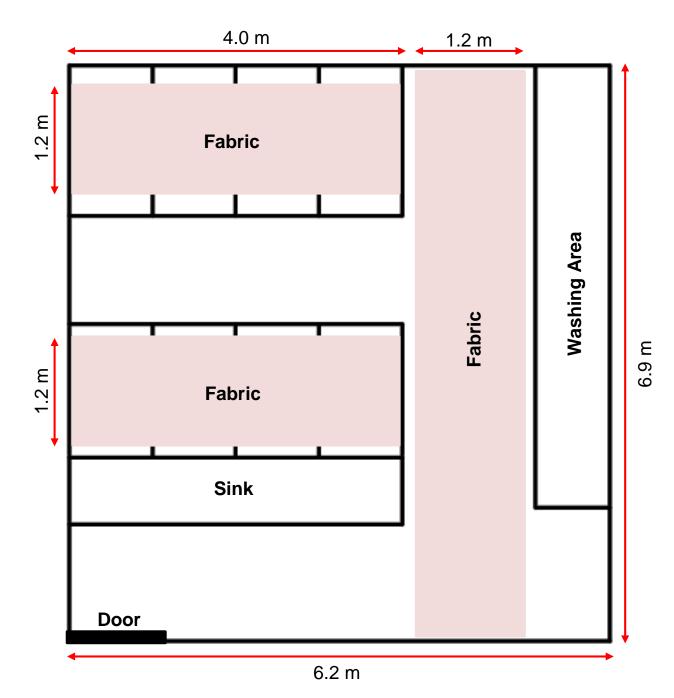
Horizontal installation of fabric in the respective toilet location
